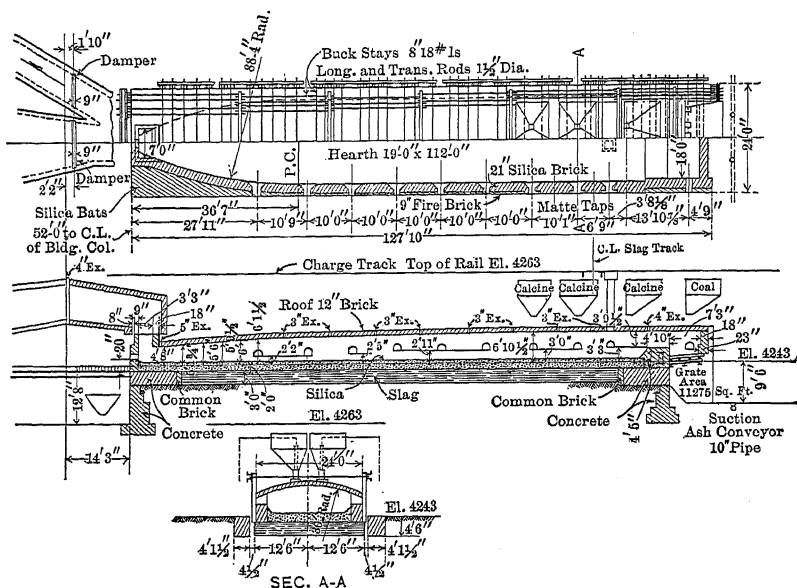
PLAN AND ELEVATION OF FURNACE. AMERICAN SMELTERS SECURITIES CO.
